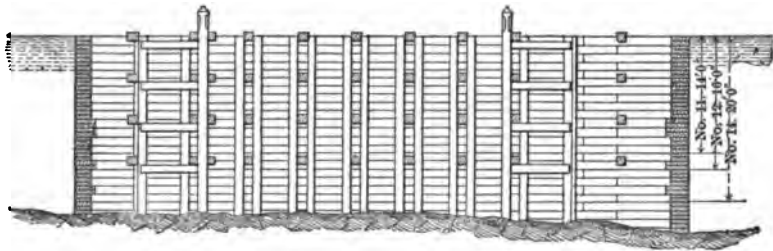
ST. LAWRENCE RIVER BRIDGE, CRIB AND COFFER-DAM, CANADIAN PACIFIC RAILWAY.
